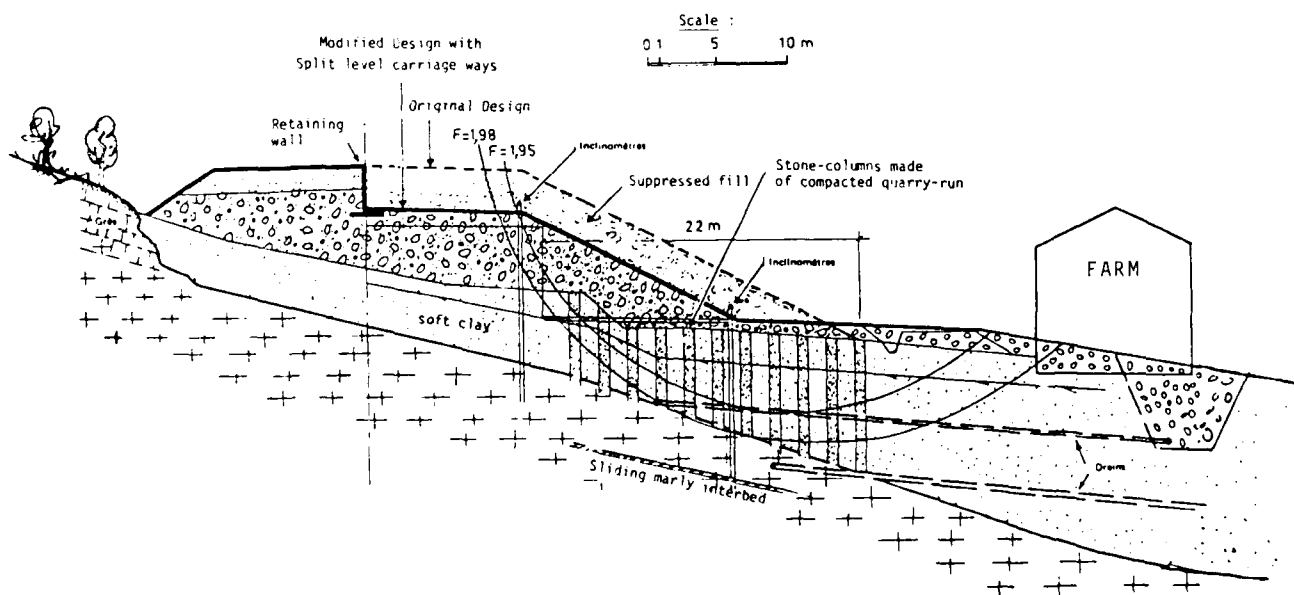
Soil profil at "Chez Vavert" Zone with designed embankment on stone-columns
